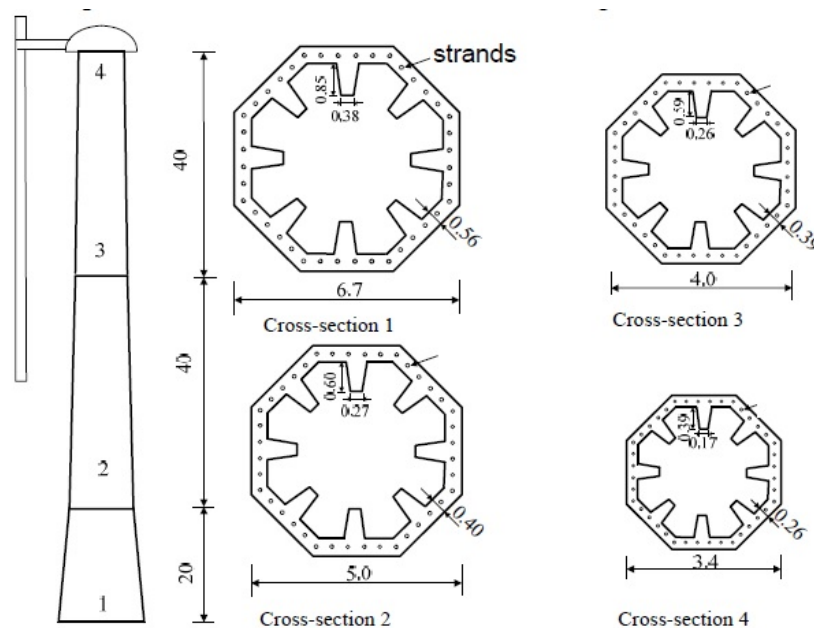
Prototype prestressed concrete wind turbine tower (unit: m)
